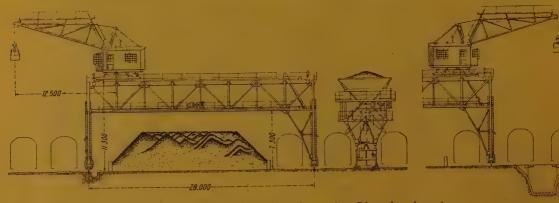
Sketch showing radius of operation. Dimensions in metres.
